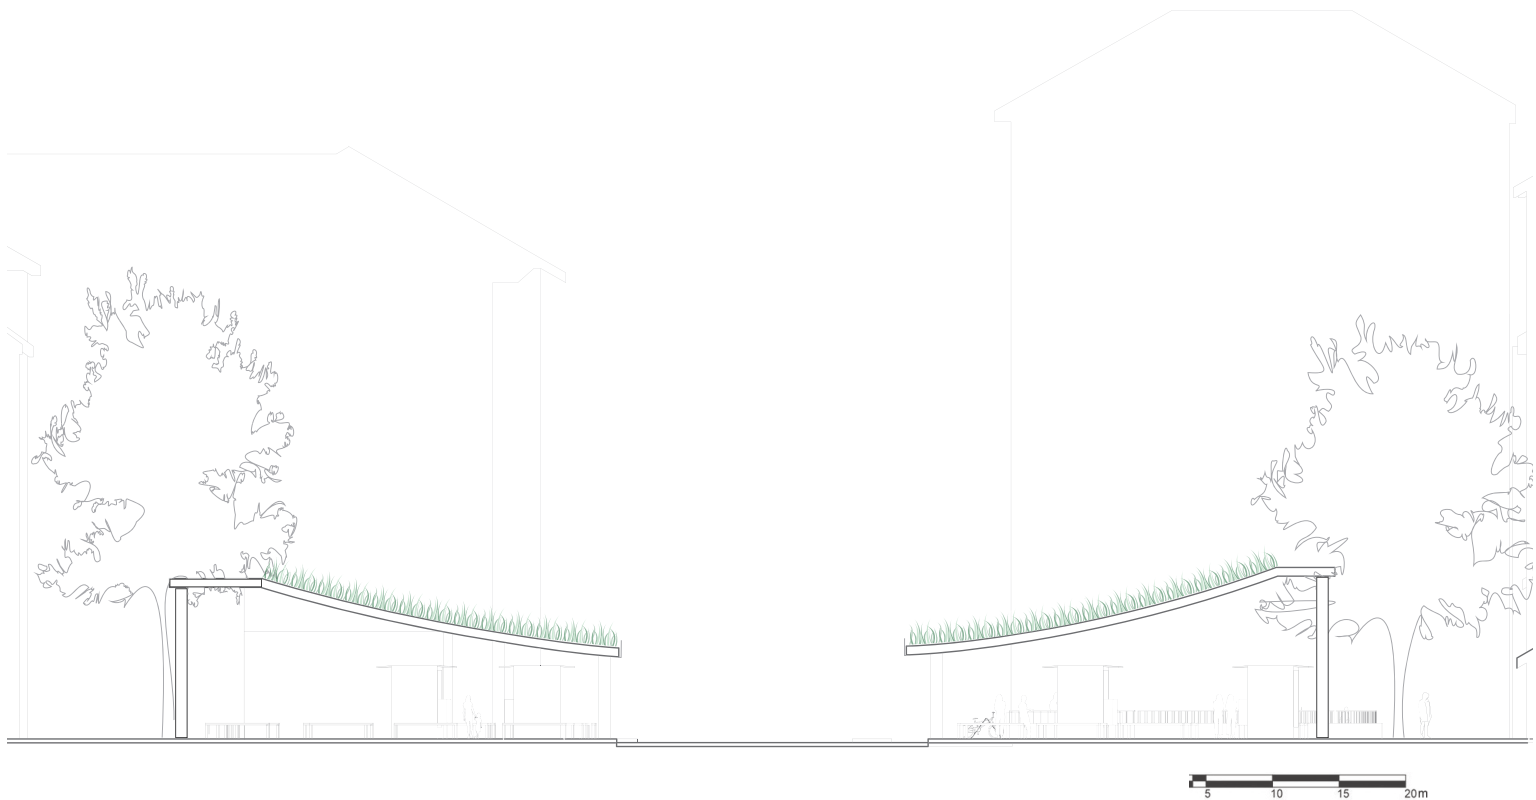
Section A-A of the designed plan - Madama Cristina market (Author drawing)
